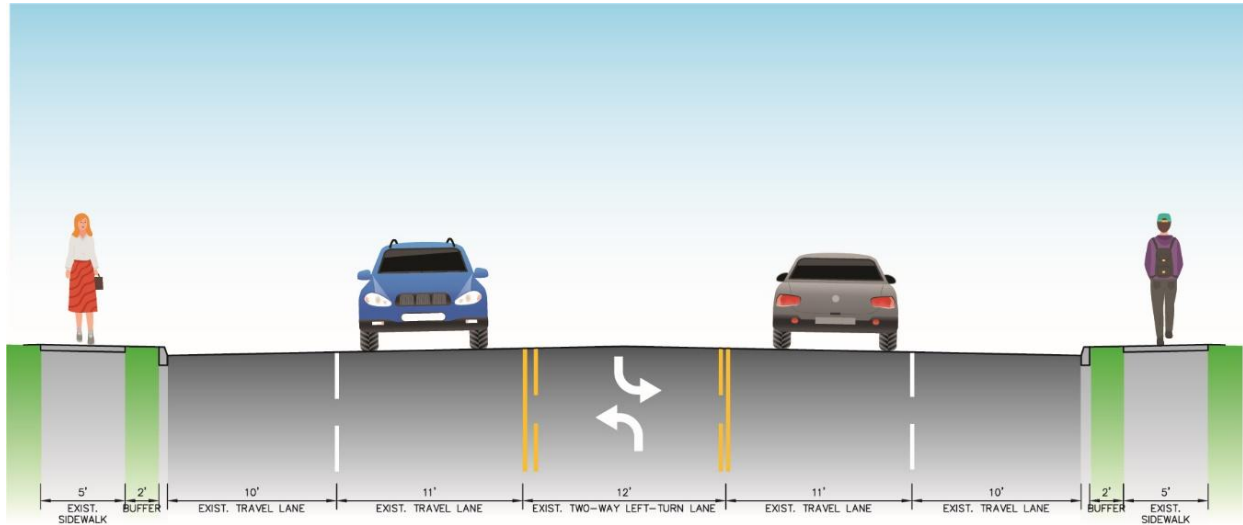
Alternative 1B: Existing / No Build (64' Pavement Width)
